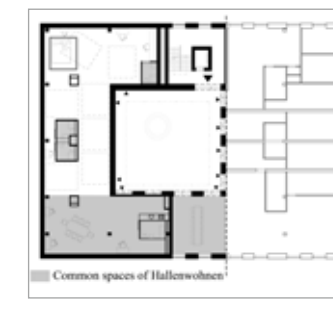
Layout of Hallenwohnen (hall dwelling apartment), building A, Zollhaus complex, Zurich center, Scale 1:400 (Source: Own drawing based on architectural drawings of Enzmann and Fischer Architekten)
